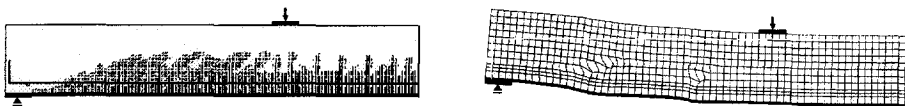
Fully plated, no stirrups: partially and fully open cracks and incremental displacements at 33.6 kN; initiation of flexural shear cracks
